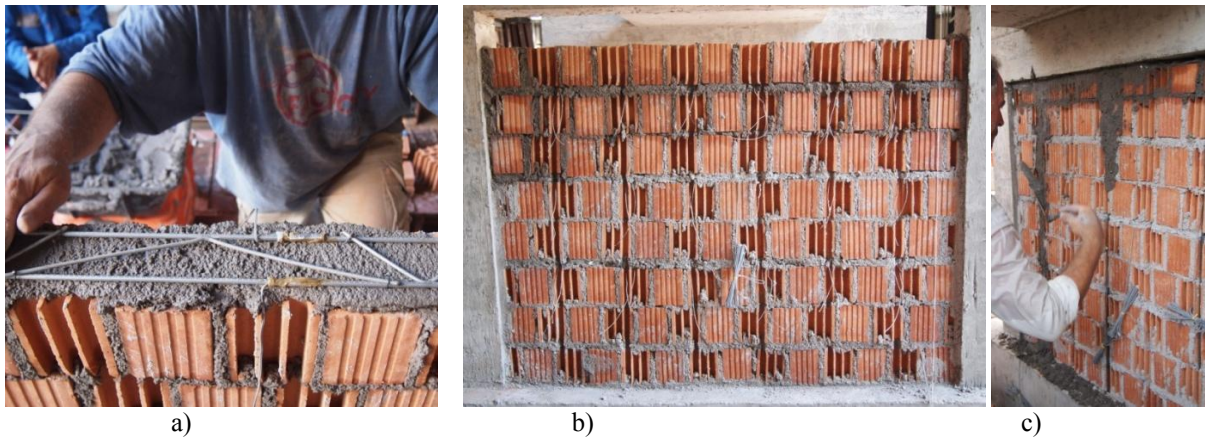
Construction of the scaled specimen INSYSTEM 2: a) Positioning of the horizontal reinforcement, b) View of the infill wall, special cavities for the vertical reinforcement, c) Cavities filled with cement mortar.
